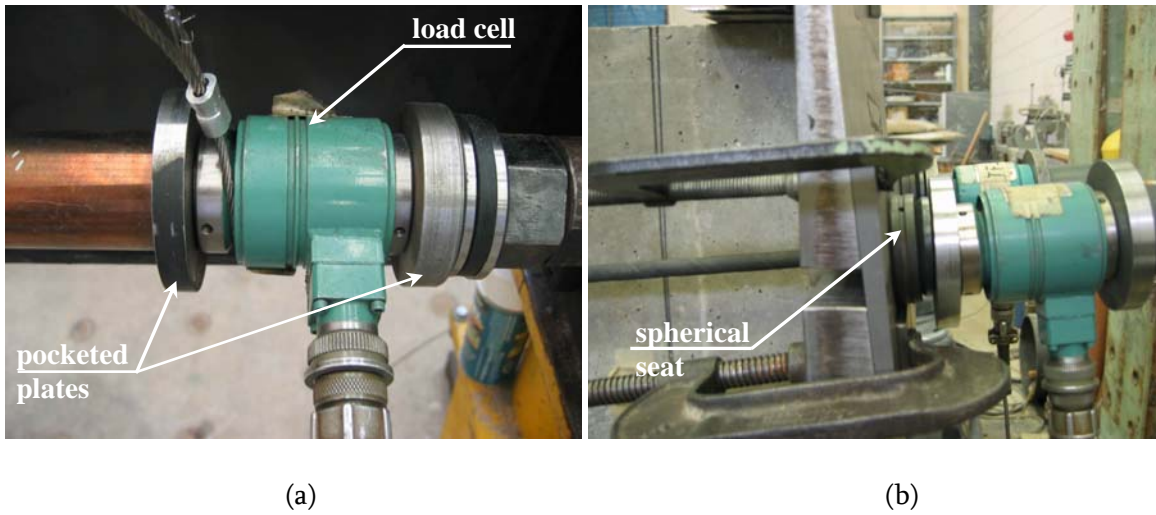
Post-tensioning system: (a) load cell between pocketed plates at the jacking end, (b) load cell seated on spherical seat at the dead end
